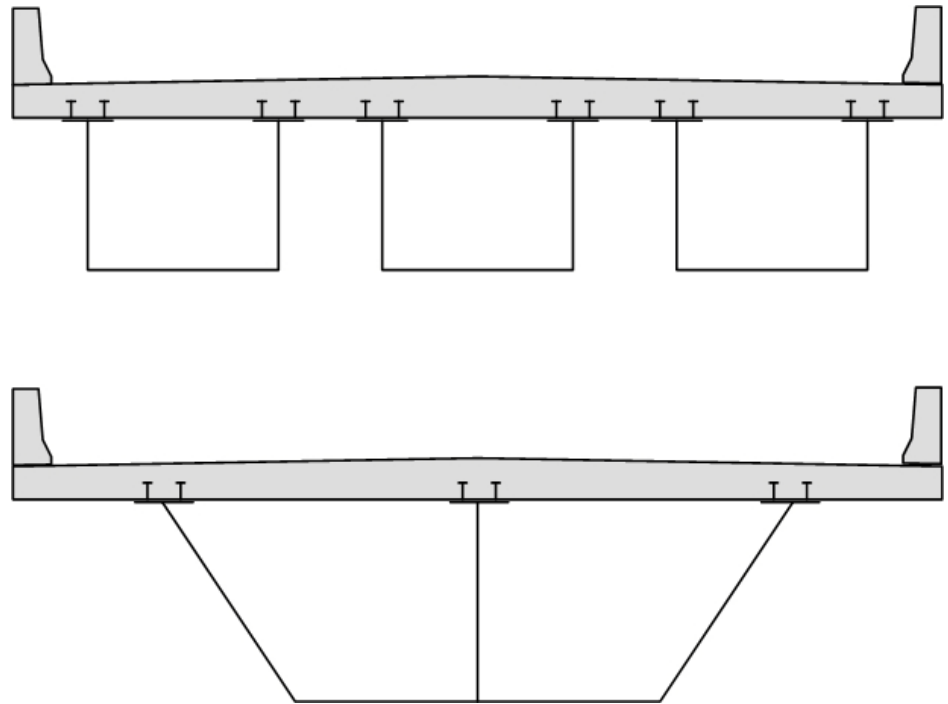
Box Girder Cross Section with Composite Deck
